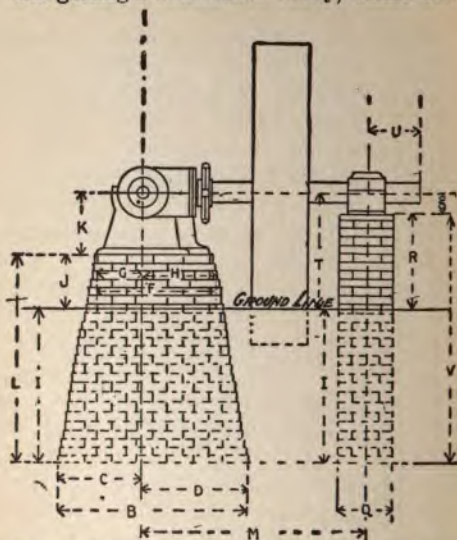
FOUNDATIONS ATLAS ENGINE, END ELEVATION.
